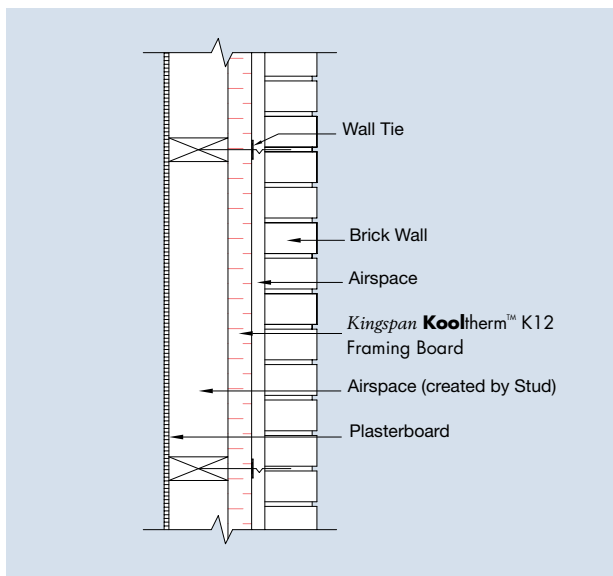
Side elevation – Brick Veneer wall with Kingspan Kooltherm™ K12 Framing Board
